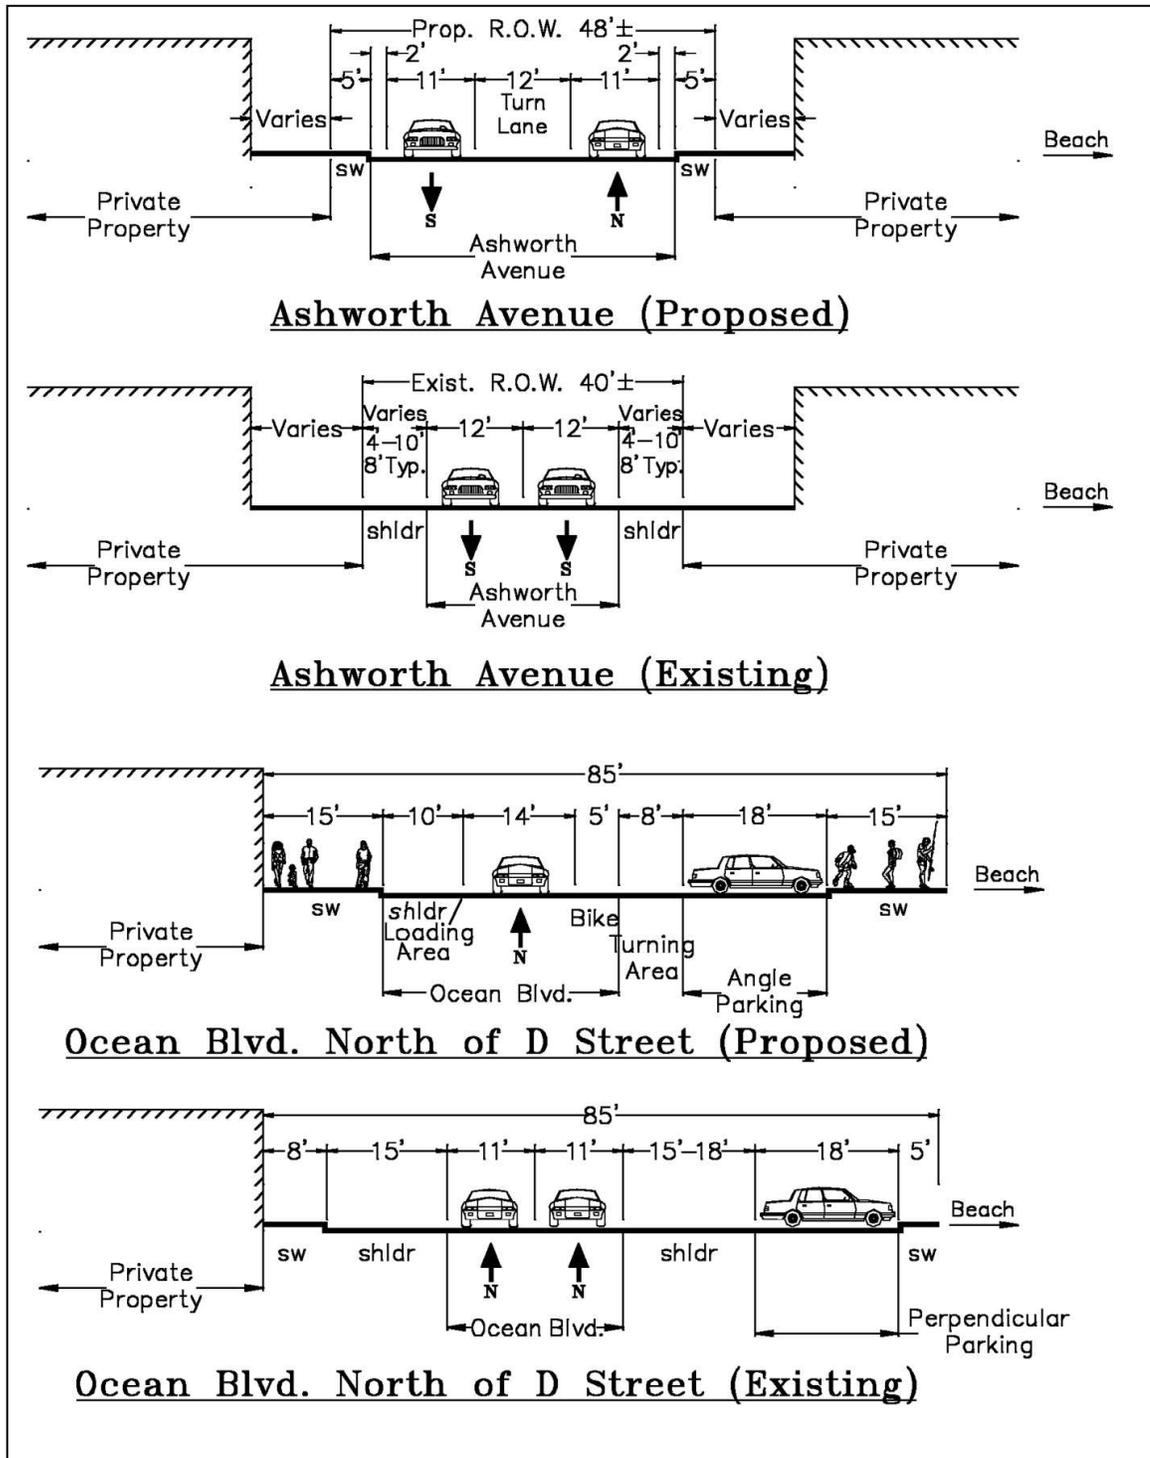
Proposed Cross-sections of Ocean Boulevard and Ashworth Avenue.
